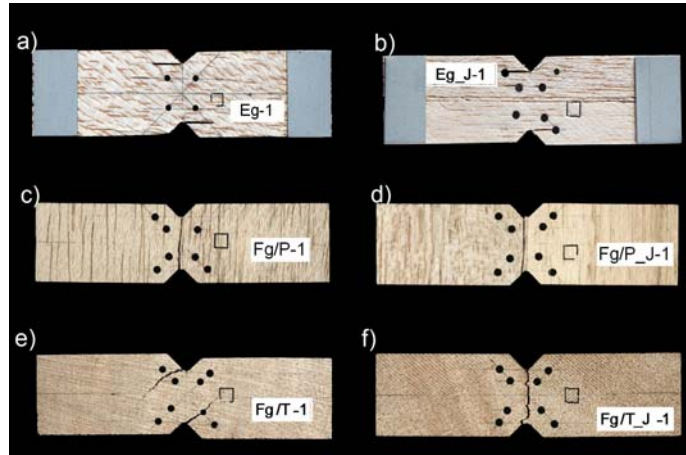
Failure mode for specimens: a) Eg-1, b) Eg_J-1, c) Fg/P_1, e) Fg/T-1 and f) Fg/T_J-1
